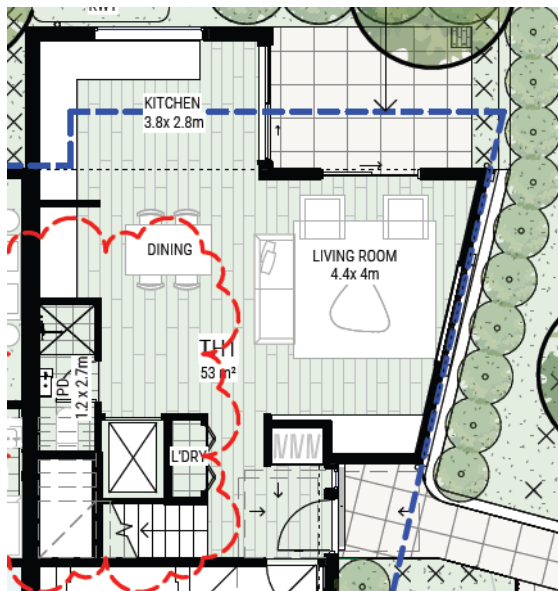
excerpt of the ground floor plan showing that the proposed passenger lift is appropriately located to achieve access within the dwelling
